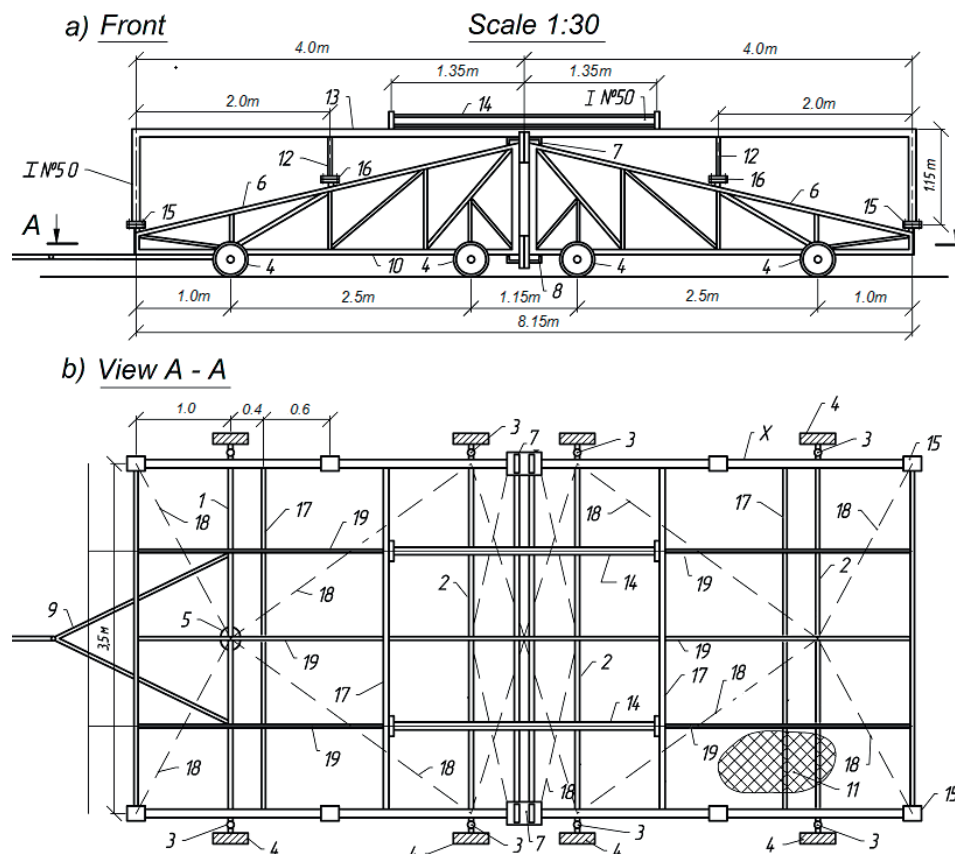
General view of the modular overpass in the transport position: 1 - front swivel axle; 2 - middle and rear axles; 3 - device for turning wheels; 4 - wheels with low pressure tires; 5 - steering gear; 6 - inclined module with running gear (steel truss); 7 - upper transport locks; 8 - lower transport locks; 9 - towing device; 10 - lower truss chord; 11 - metal corrugated flooring; 12 - transportation rack; 13 - an upper portion of an orthogonal Π -shaped module; 14 - lower portion of an orthogonal Π -shaped module; 15 - angular node joint of elements 6 and 13; 16 - intermediate node joint of elements 6 and 13; 17 - transverse beams of chassis frame; 18 - push-pull rods providing rigidity; 19 - longitudinal beams of chassis frame
